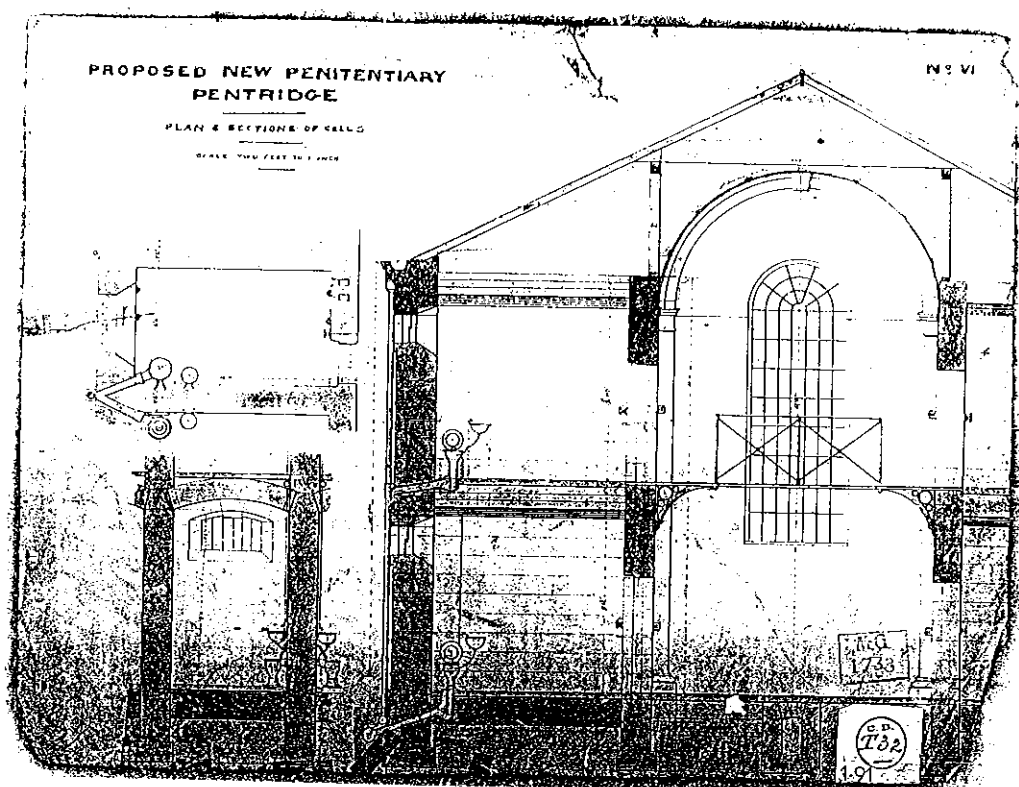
Proposed New Penitentiary. Pentridge. Plan and Sections of Cells. c. 1858 contract drawing. Office of Building microfilm no PGP 1.91
